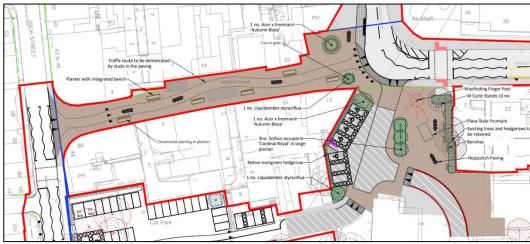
Proposed pedestrianisation of Market Street and space leading to the town square
